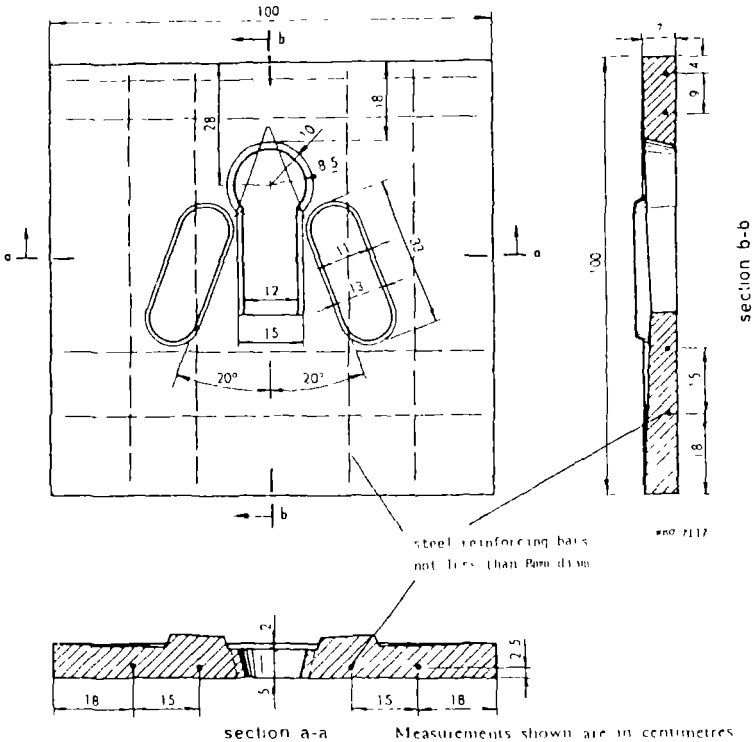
Square reinforced concrete squatting slab for a pit latrine (From Wagner & Lanoix)
